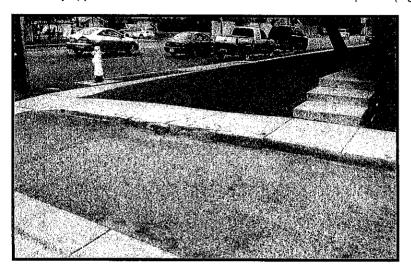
Broken Curb and Sidewalk on Alley 44 Near Baker St.
